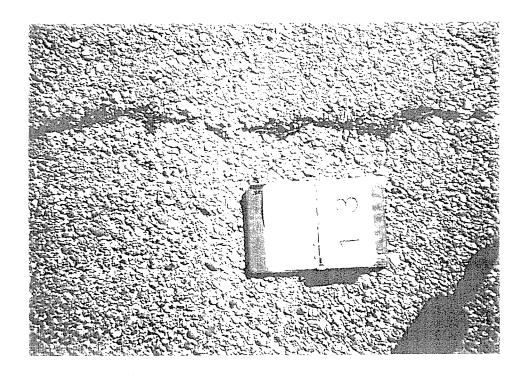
Crack of Photo 3.8 After Vegetation Burning
